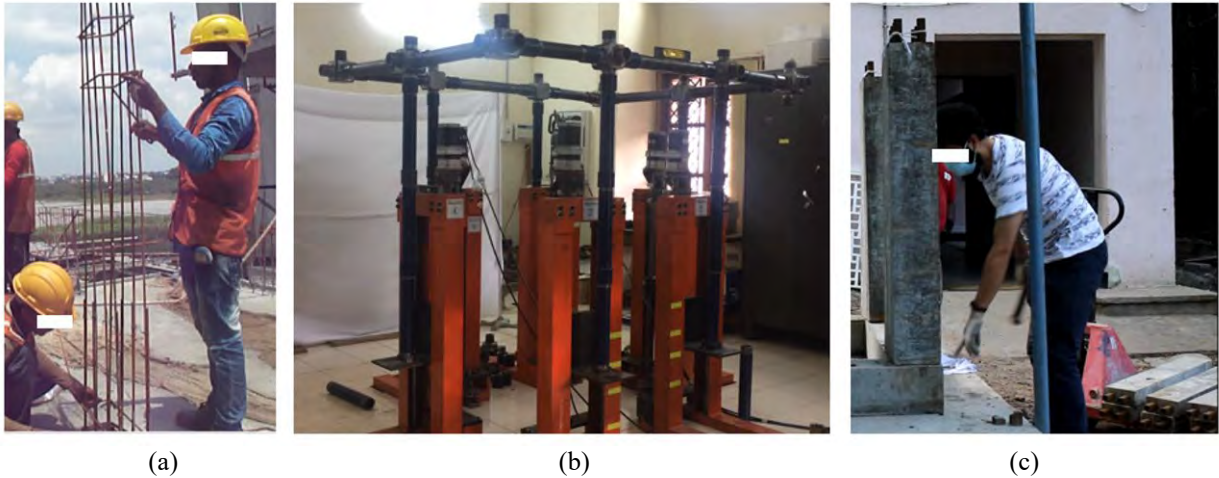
Construction process typology cases: (a) RCC frame assembly, (b) steel frame assembly, and (c) precast frame assembly
